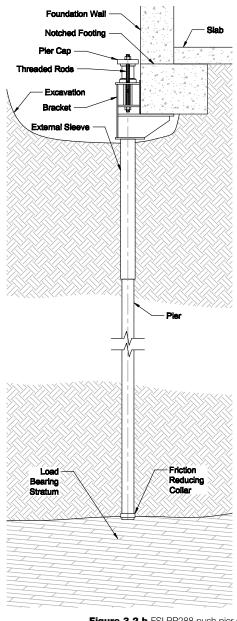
b FSI PP288 push pier system with an under-footing bracket
